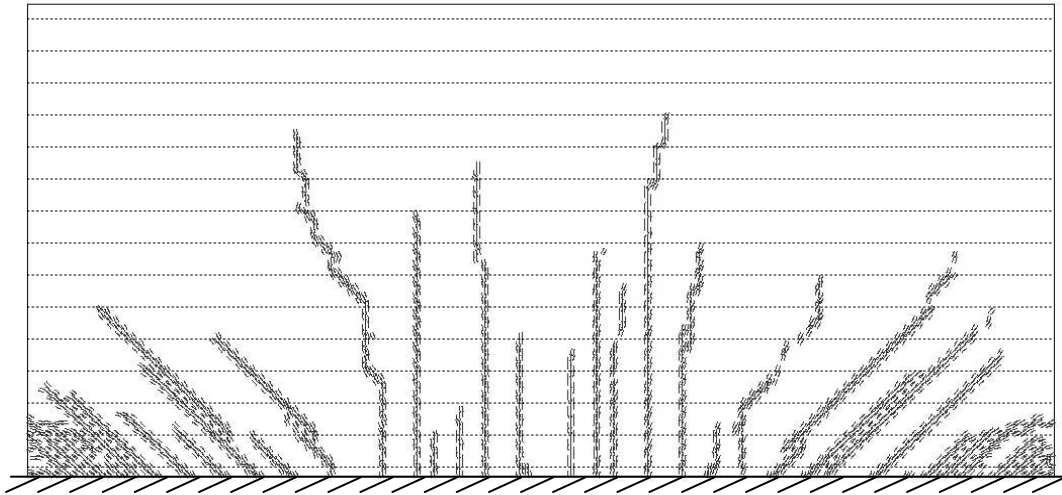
Crack pattern for wall with cross-section 1 including fibre reinforcement.
